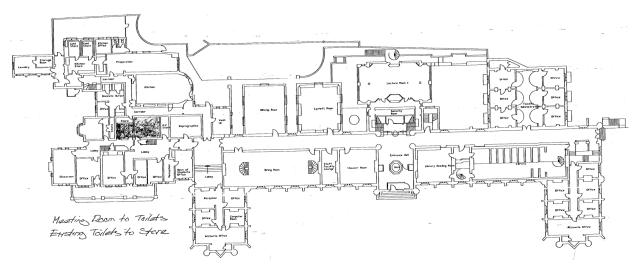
Existing ground floor plan of principal building (ref: 00/0882).
